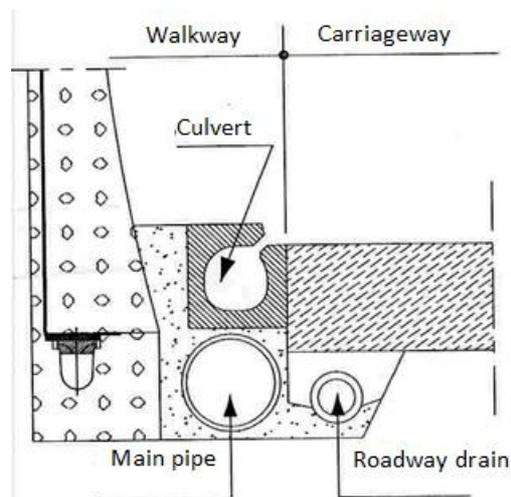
extrados drainage channel, roadway drain, collector pipe and slotted drainage channel
